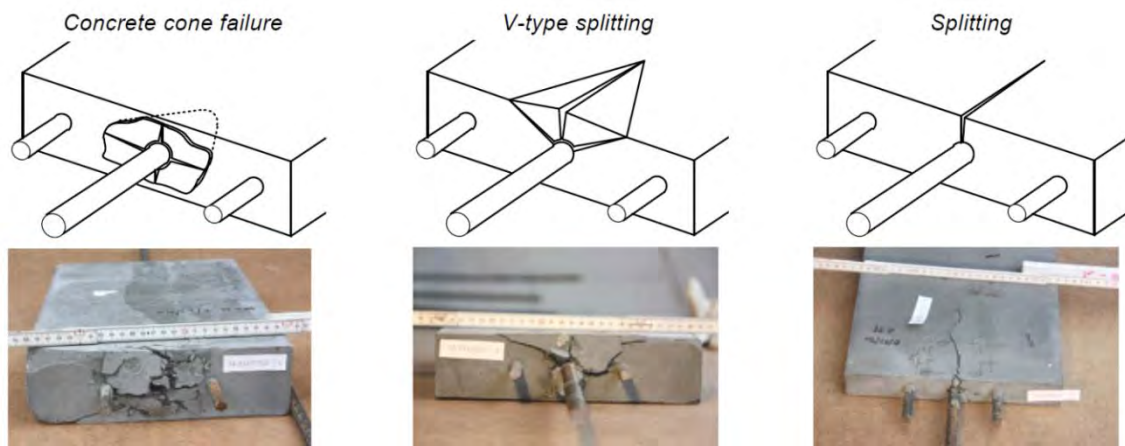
Concrete Failure Modes of UHPC Pullout Test (Fehling et al., 2011)
